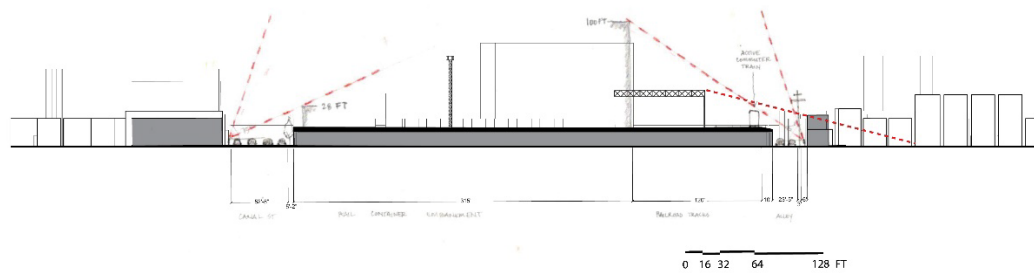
Site transverse section analyzing sight lines from adjacent streets.
